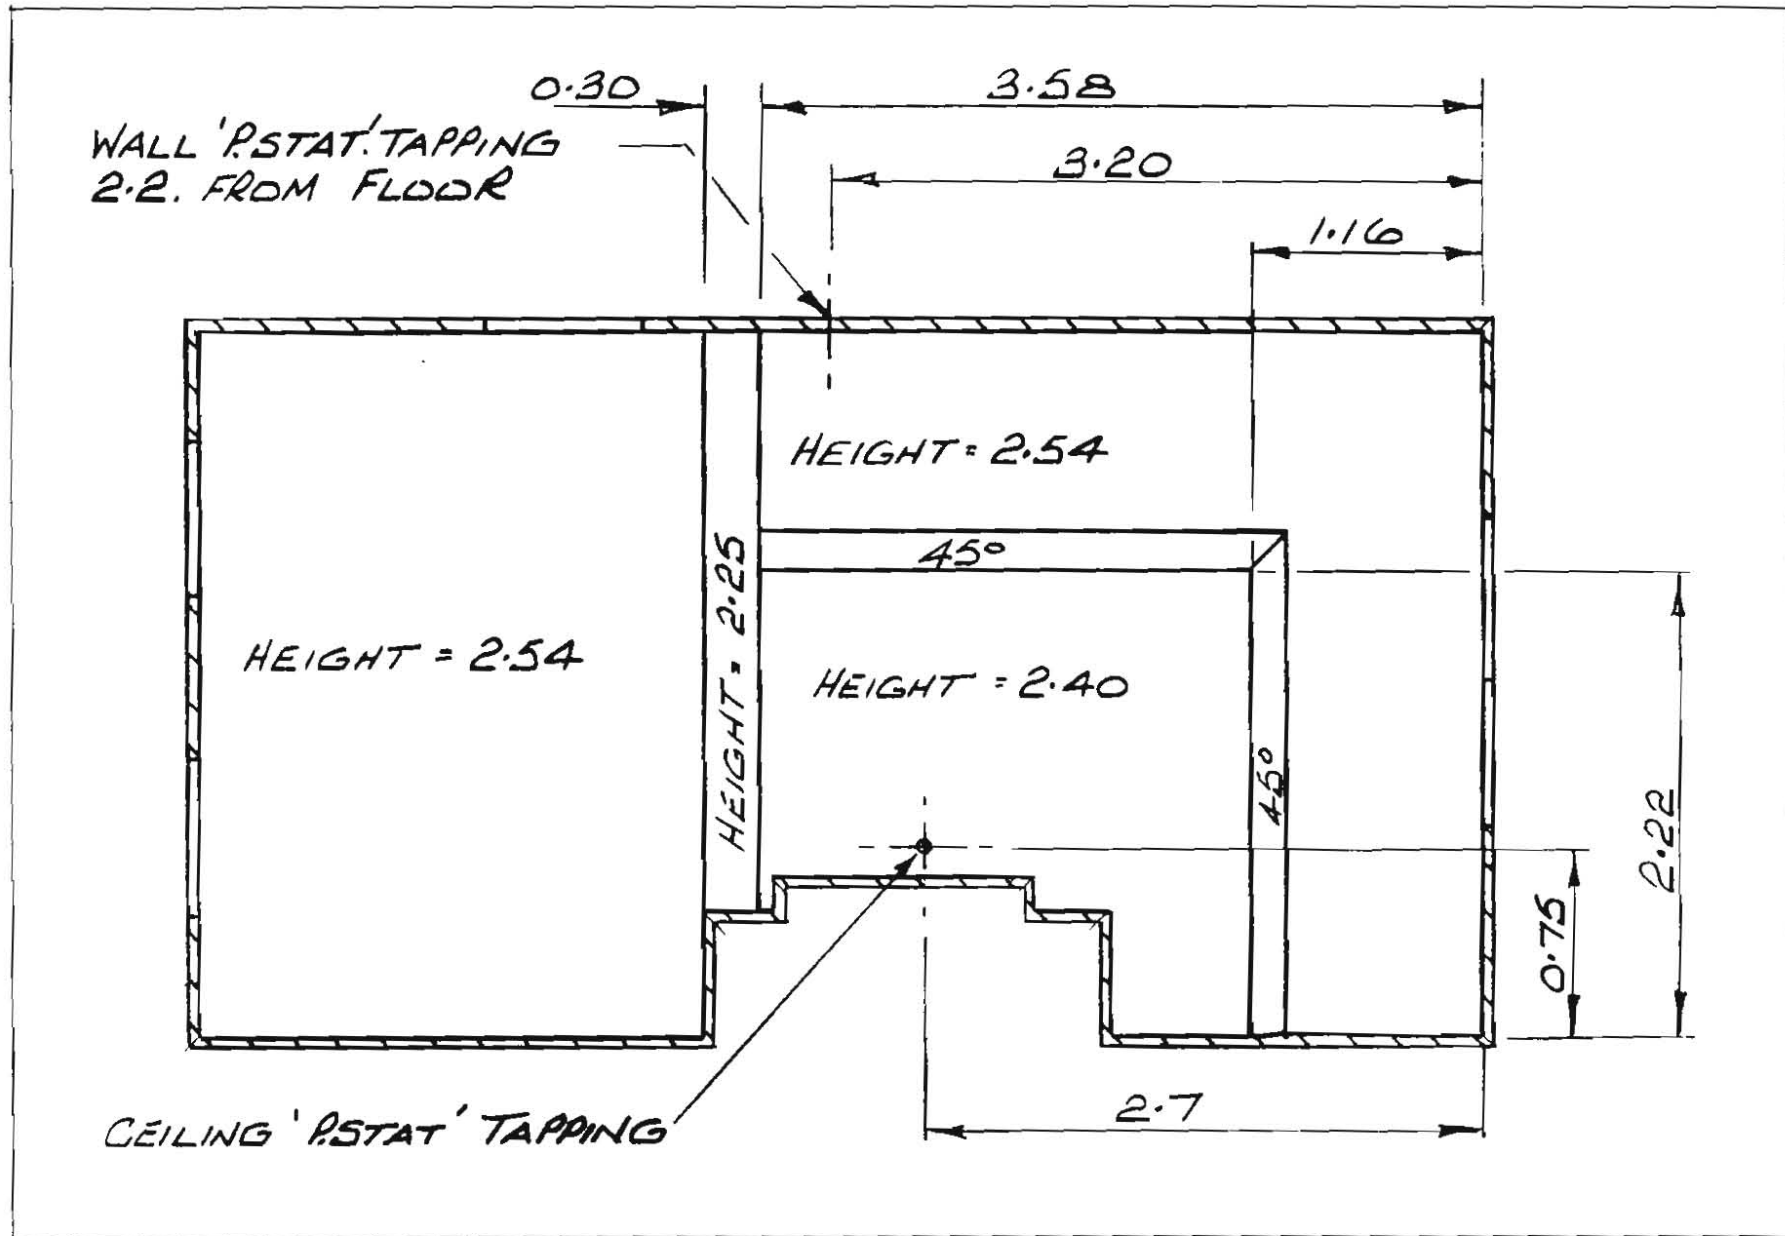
Details of Room Ceiling and Positions of Static Pressure Probes in Mock-up Room
